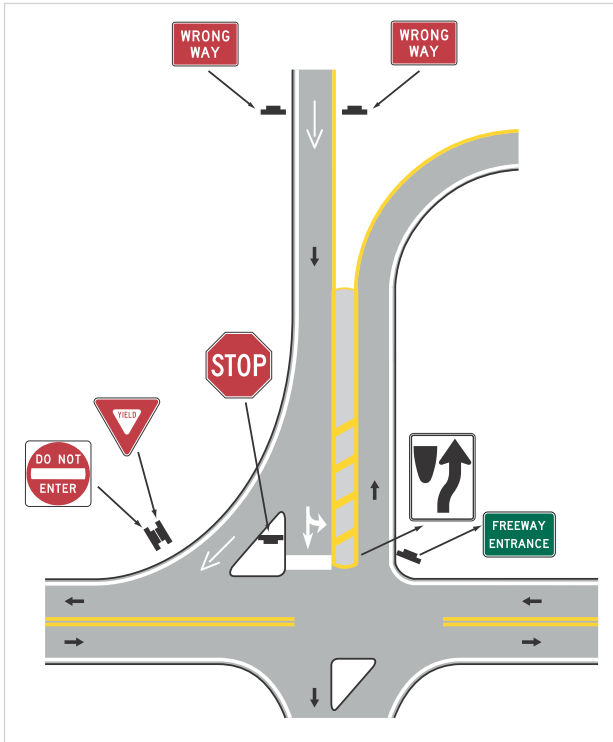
Recommended signs and markings for adjacent entrance/exit ramps at a crossroad intersection
